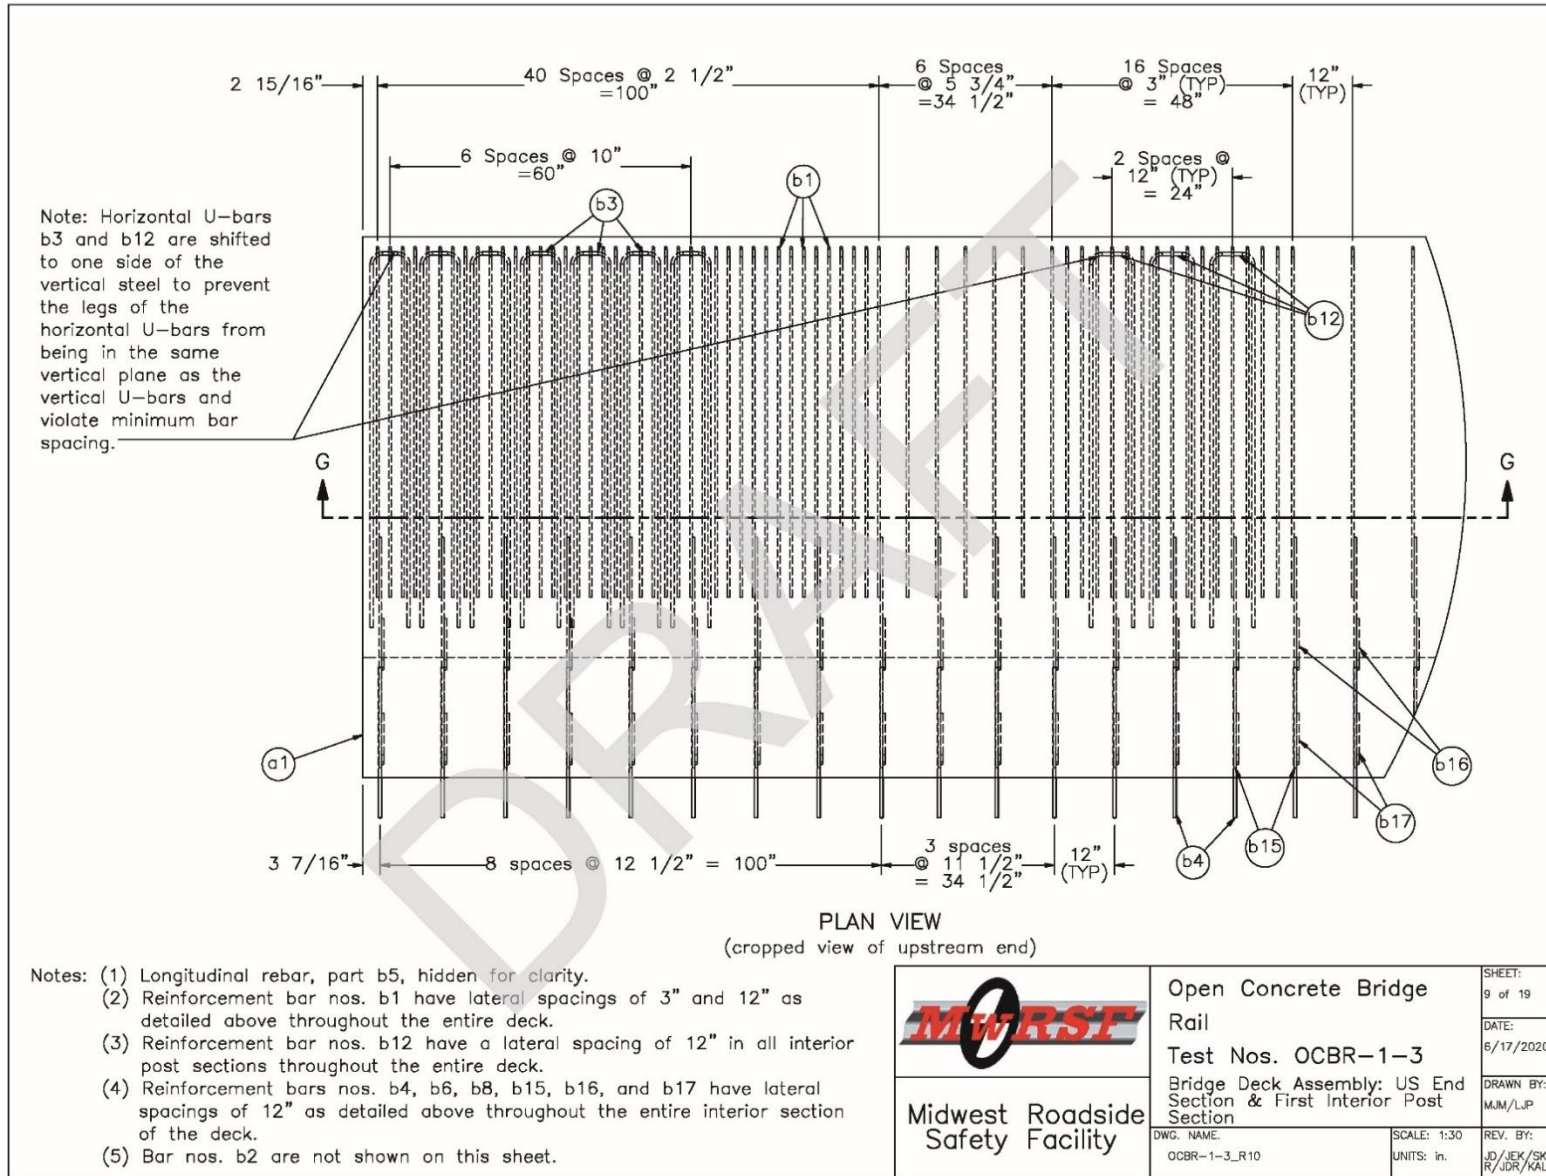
Open Concrete Bridge Rail Upstream End Section and First Interior Post Bridge Deck Assembly
